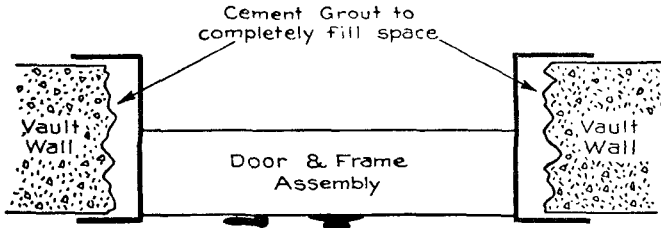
Installation when Vestibule Laps Both Faces of Wall.
